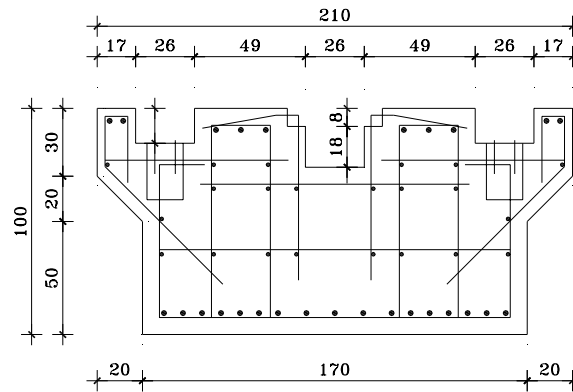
Cross-section 2-2 with reinforcement of girders shown in Figure 5
